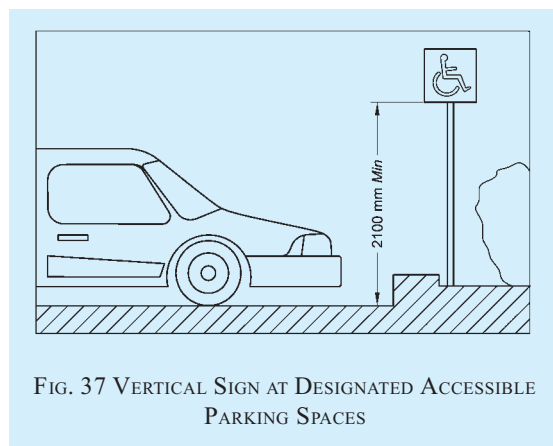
VERTICAL SIGN AT DESIGNATED ACCESSIBLE PARKING SPACES
